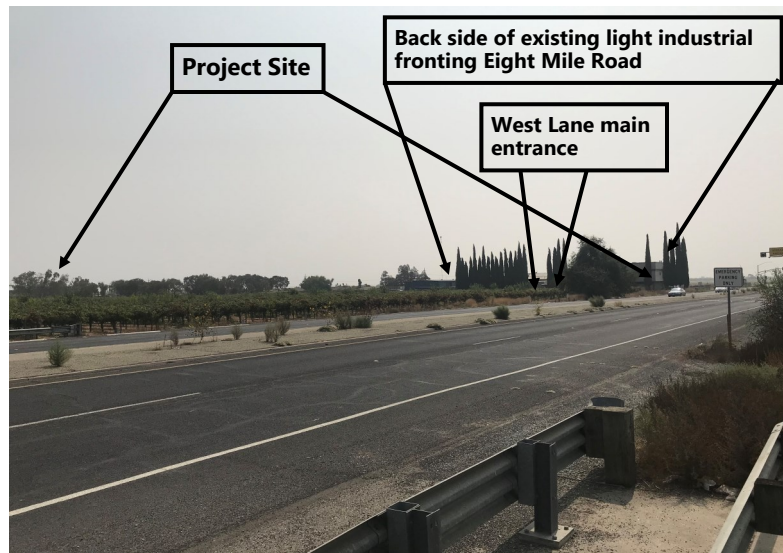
Photo A: View from West Lane Drive looking southeast at Project Site and Main entrance.
